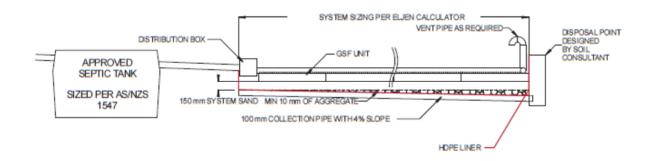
ELJEN TREATMENT BED SECTION DETAIL
